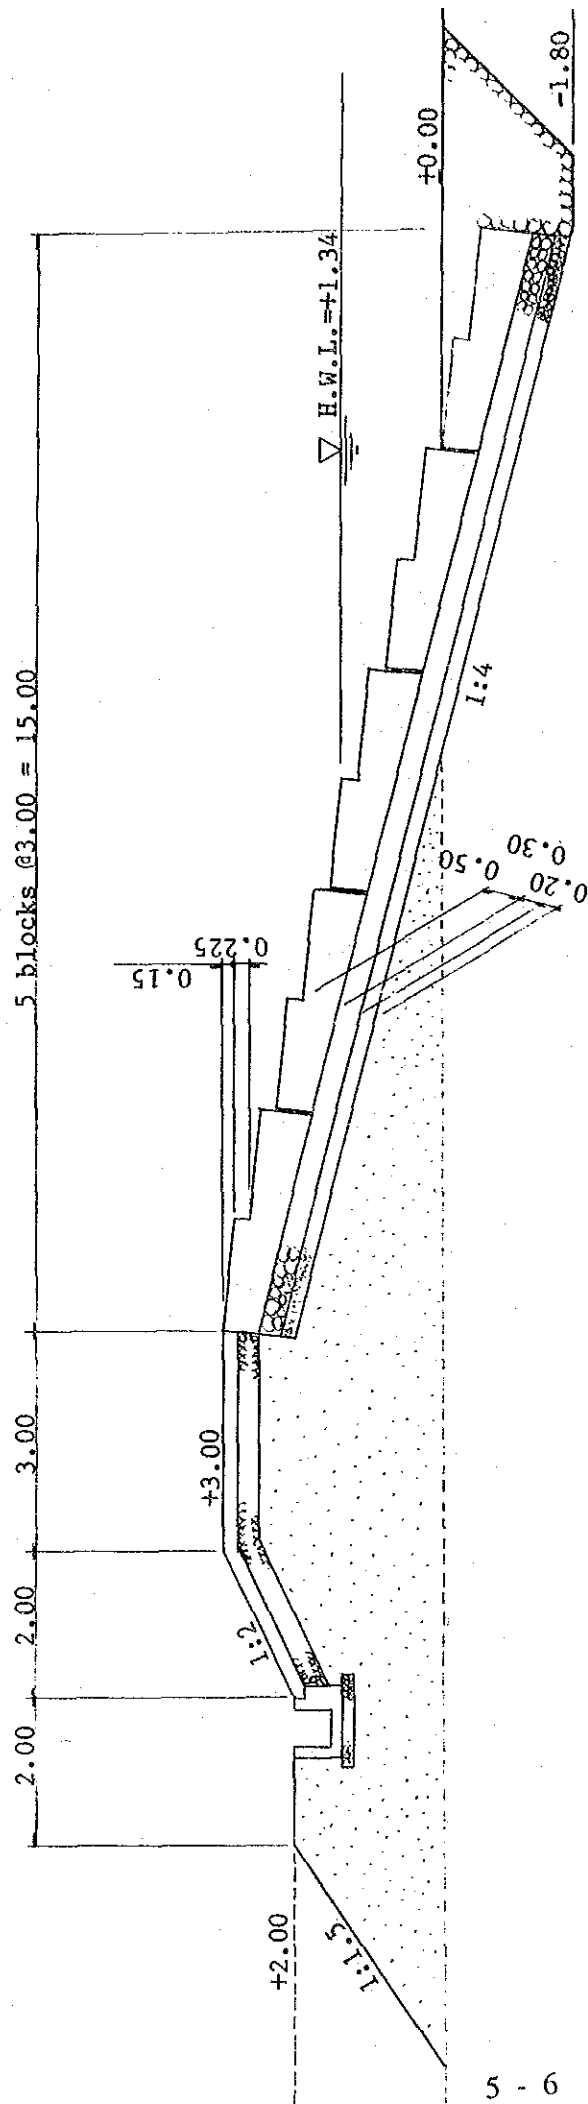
Typical Section of East Coast : Stepped Seawall (S=1:100)
